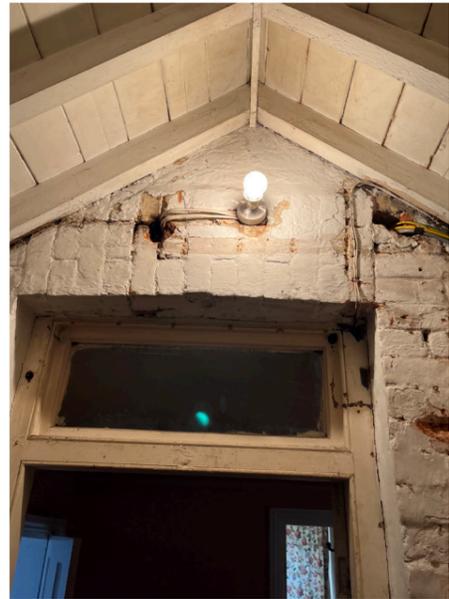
Internal view of west wing 20th c. Pantry at ground floor
